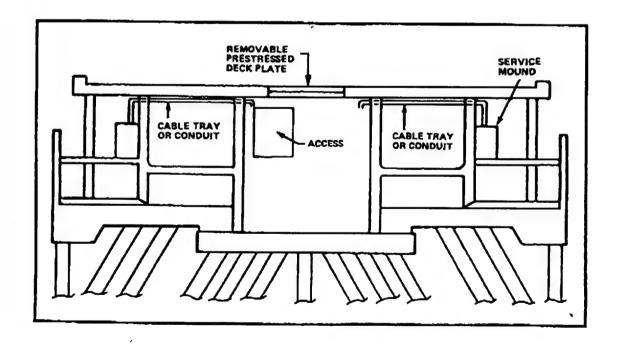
Double-deck, Open Pier. (F; 43-3 990, 3-4)
